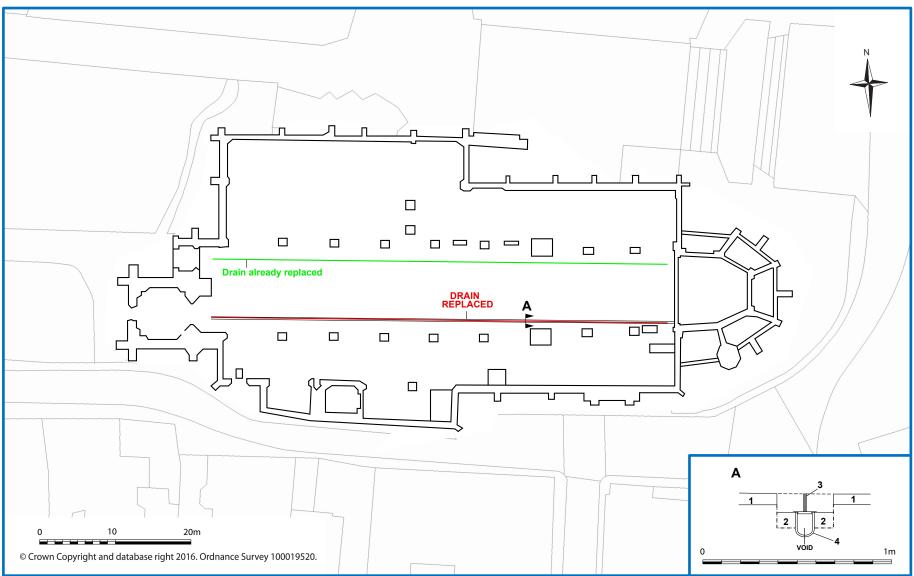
Location of drain at St Michael's Cathedral, with detail of section
